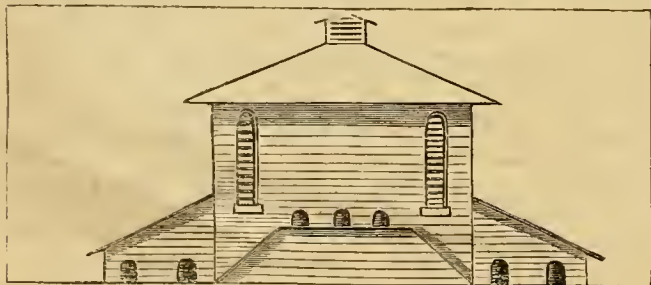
ELEVATION OF POULTRY-HOUSE.
